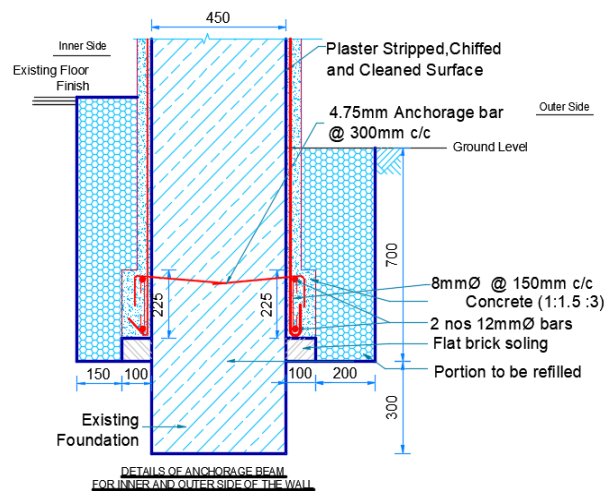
Placement of inner and outer tie beams at same level to compensate required footing width
